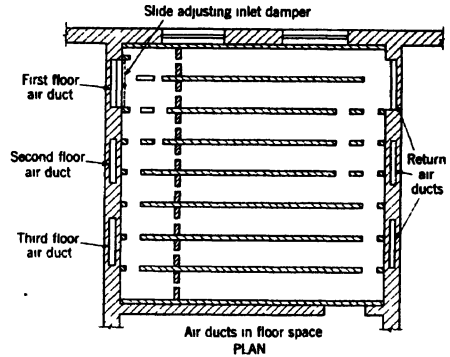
AIR DUCTS FOR FLOOR HEATING
